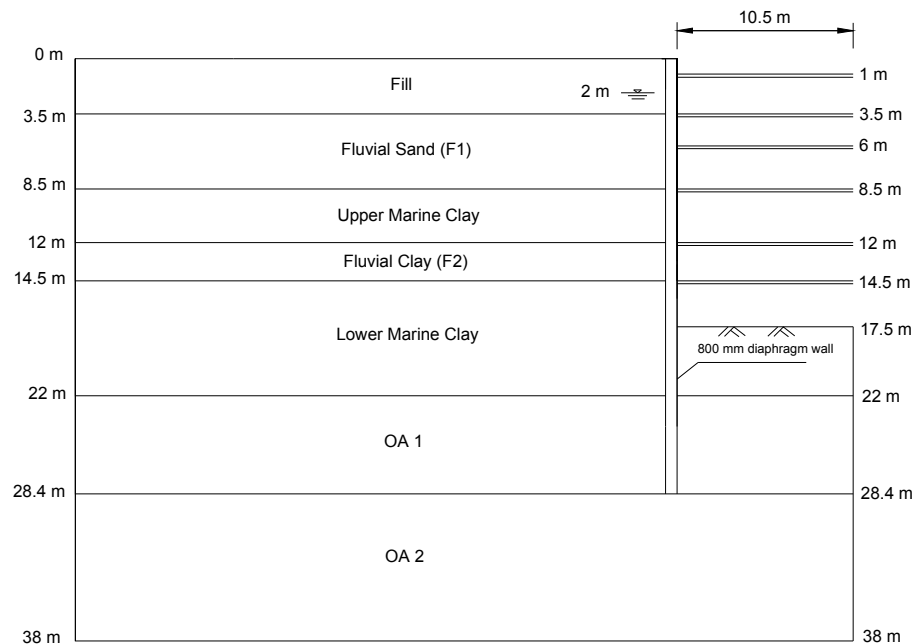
Cross-Section of Excavation at Farrer Park–Kandang Kerbau (CH 31+895) (Halim, 2008)
